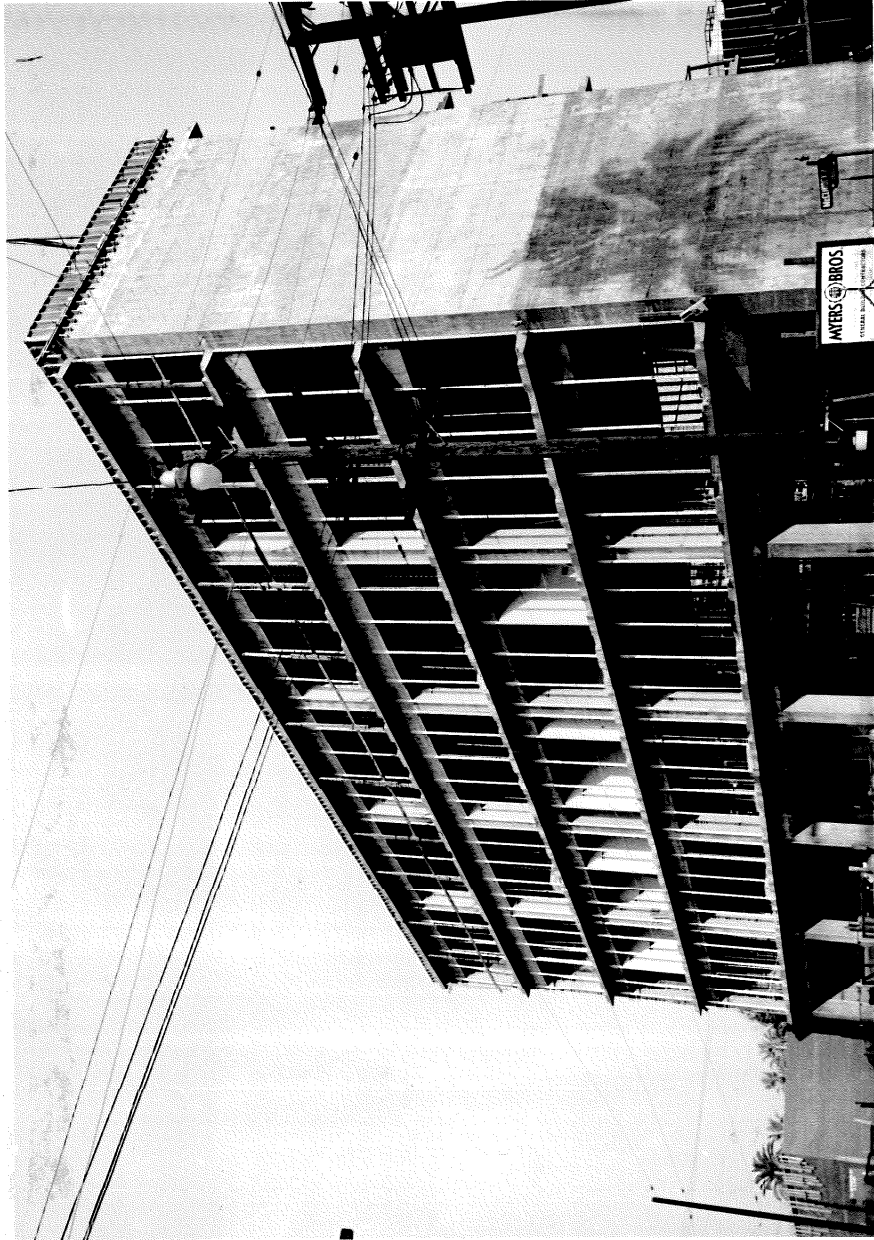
GENERAL VIEW, LOOKING NORTHEAST.
